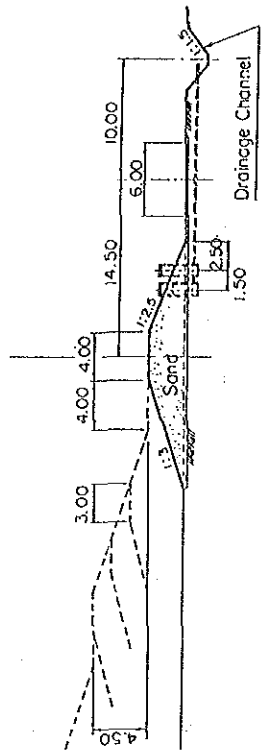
ASH DISPOSAL AREA PLAN AND SECTION
